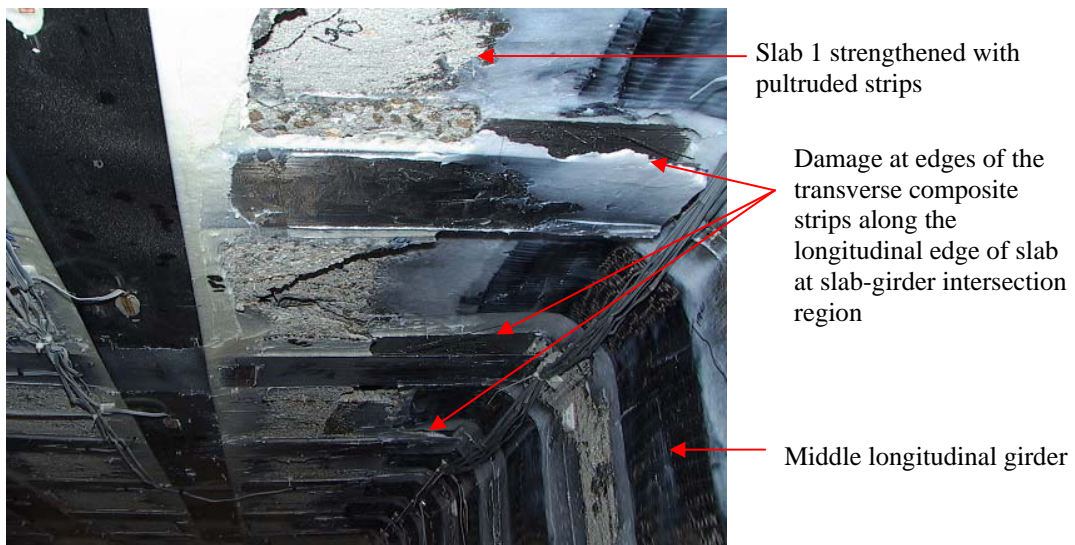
Visual observation of damage at the edges of the transverse pultruded strips on unloading specimen after reaching failure load
